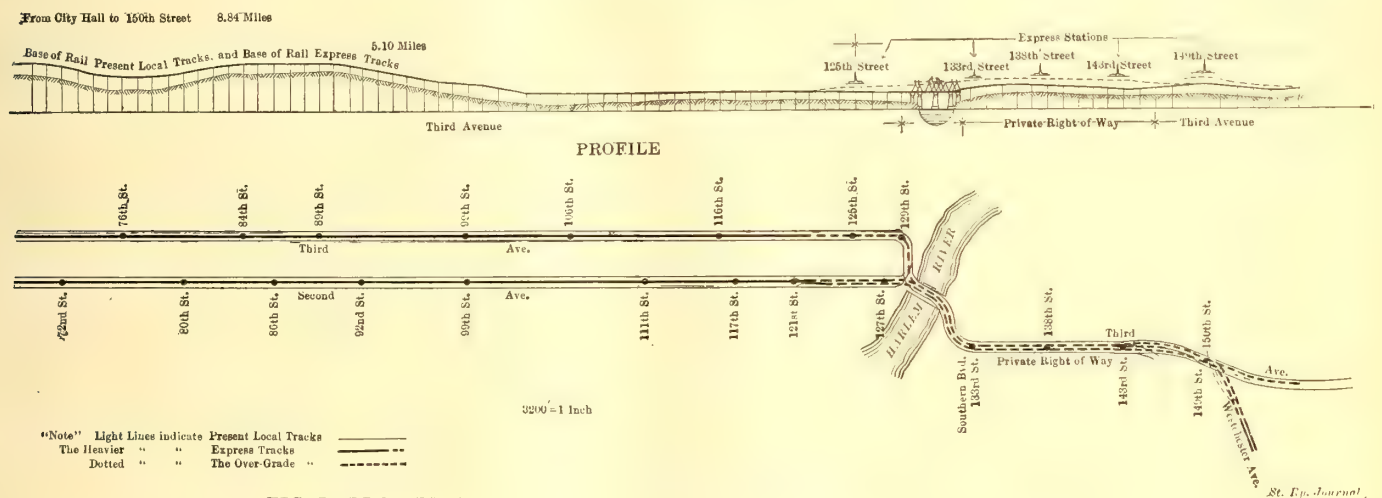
PROFILE AND PLAN OF PROPOSED ELEVATED TRACKS—(CONTINUED)
